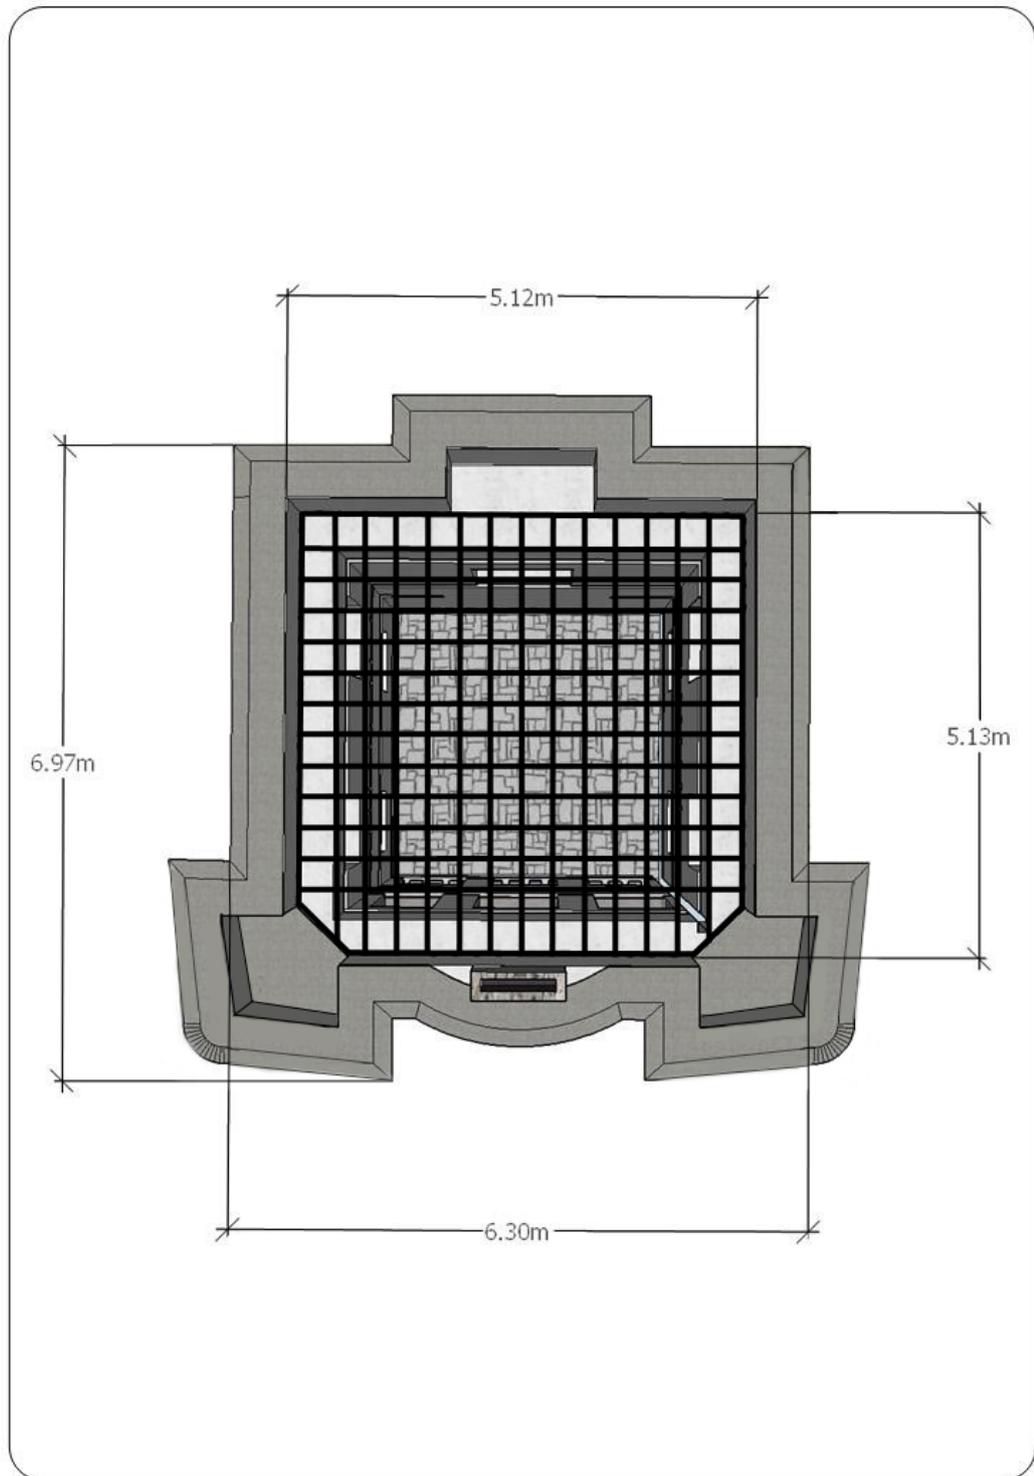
One possible layout of the timber joists that supporting flat roof, based on a grid of timbers with cross lap joints at every intersection.
